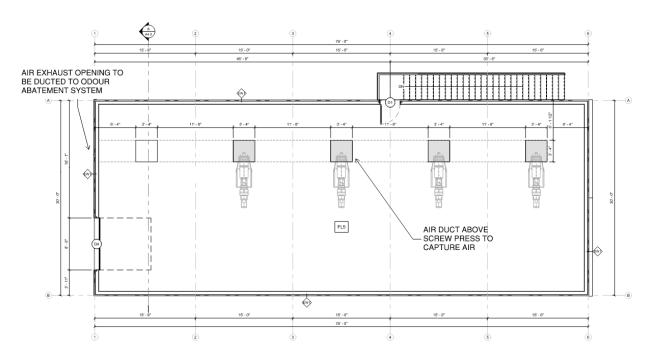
Digestate Separation Building with Air Duct Above Screw Press and Air Exhaust Opening
